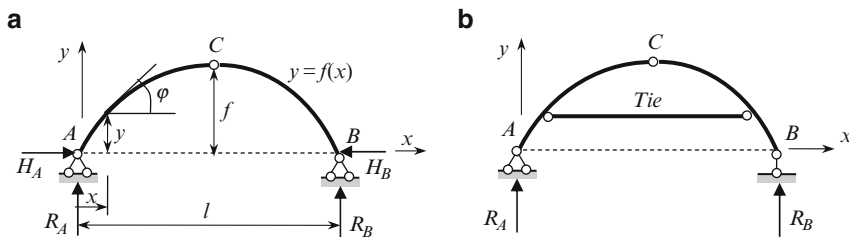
(a, b) Design diagram of three-hinged arch without tie and with elevated tie
